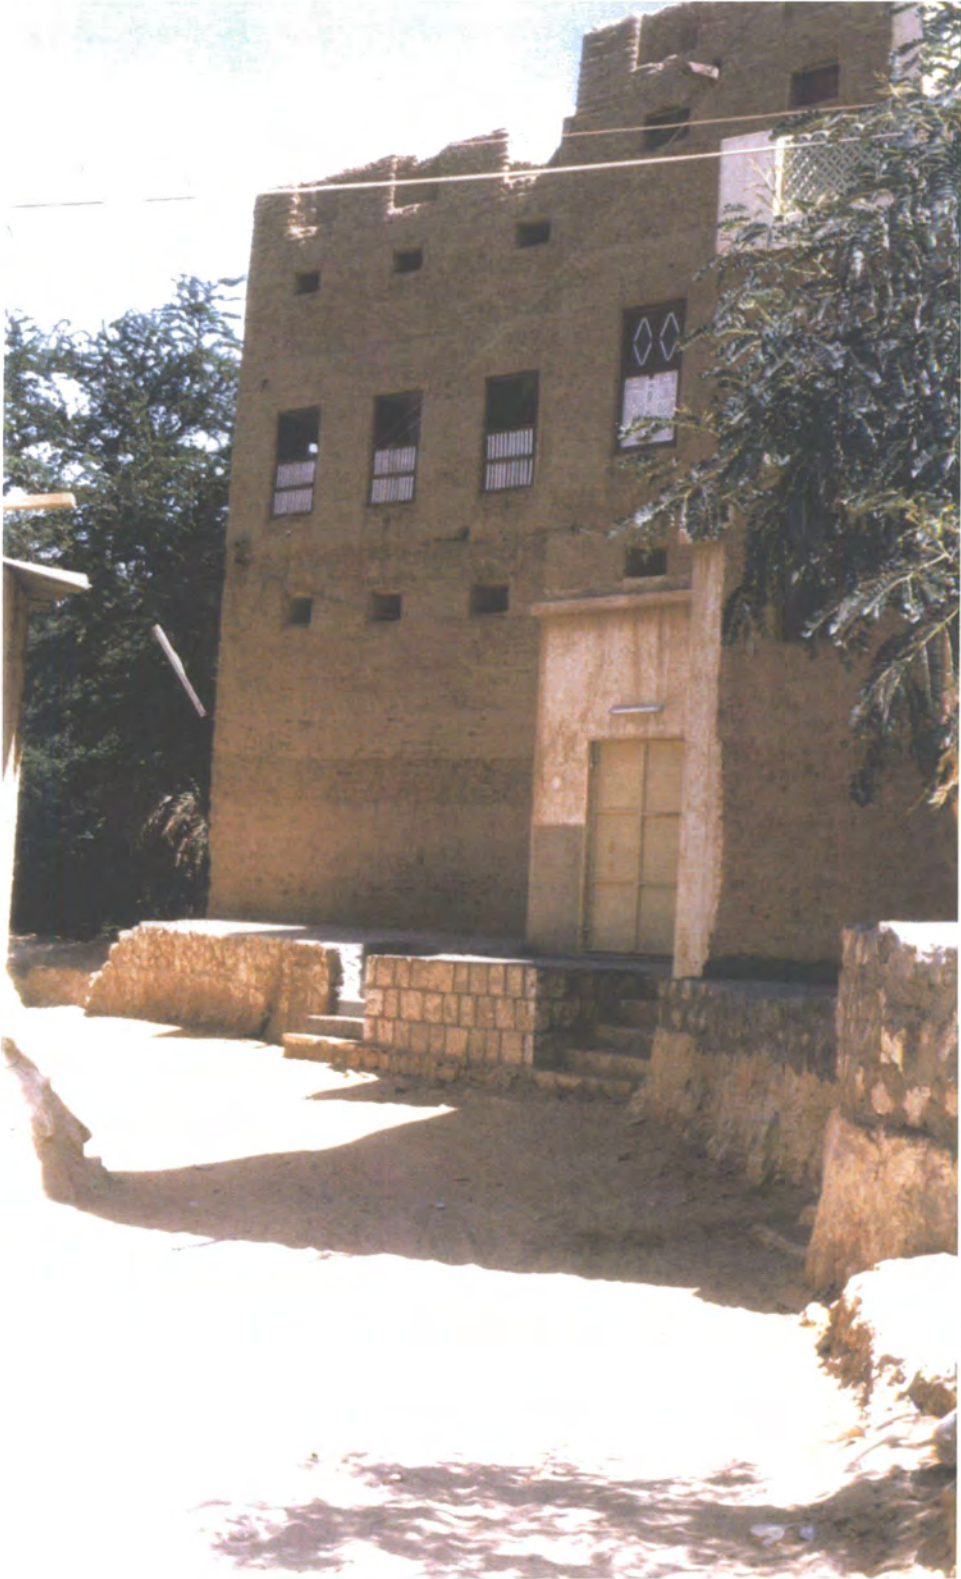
Substantial foundations used for a house on the edge of a channel in Tarim.
